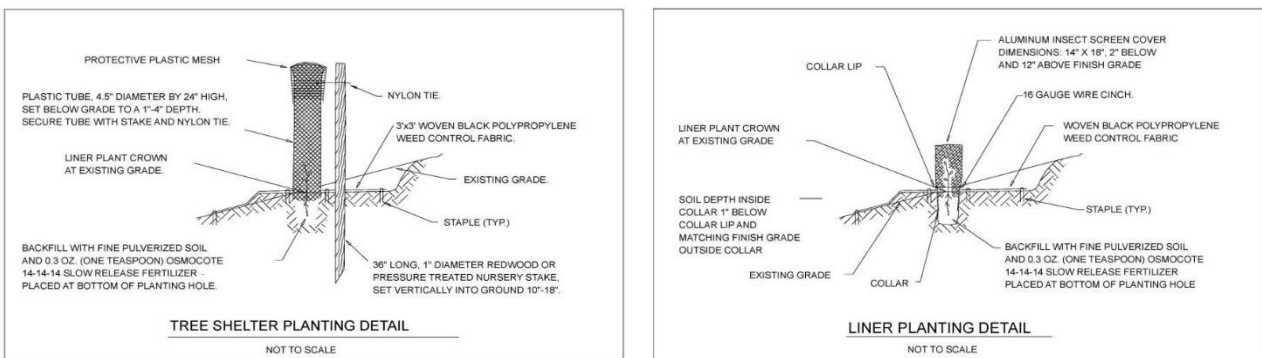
Planting details. Plant conifers approximately 20 feet apart so the forest is not overly dense and fire prone
